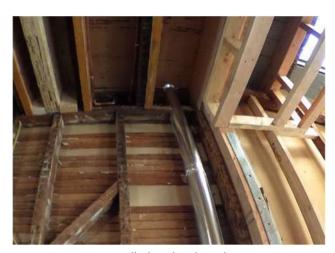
A New Vent Line installed at the Shared Property Line Bearing Wall
